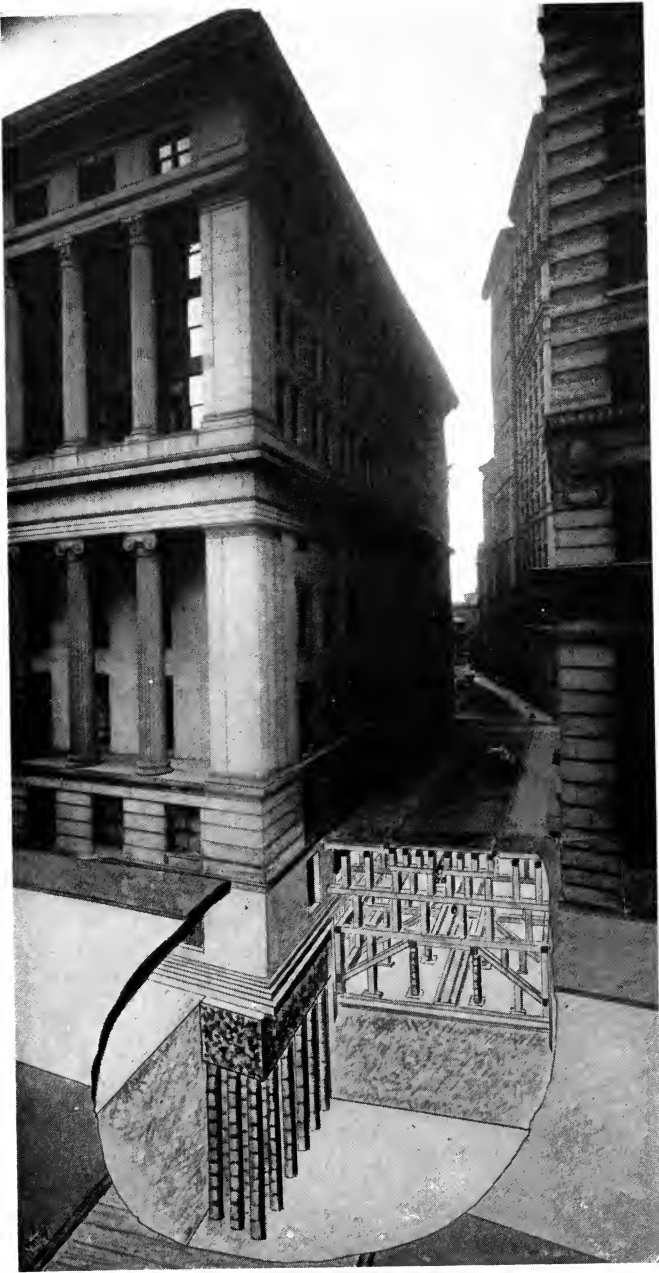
National City Bank Building, Showing Its Underpinning
